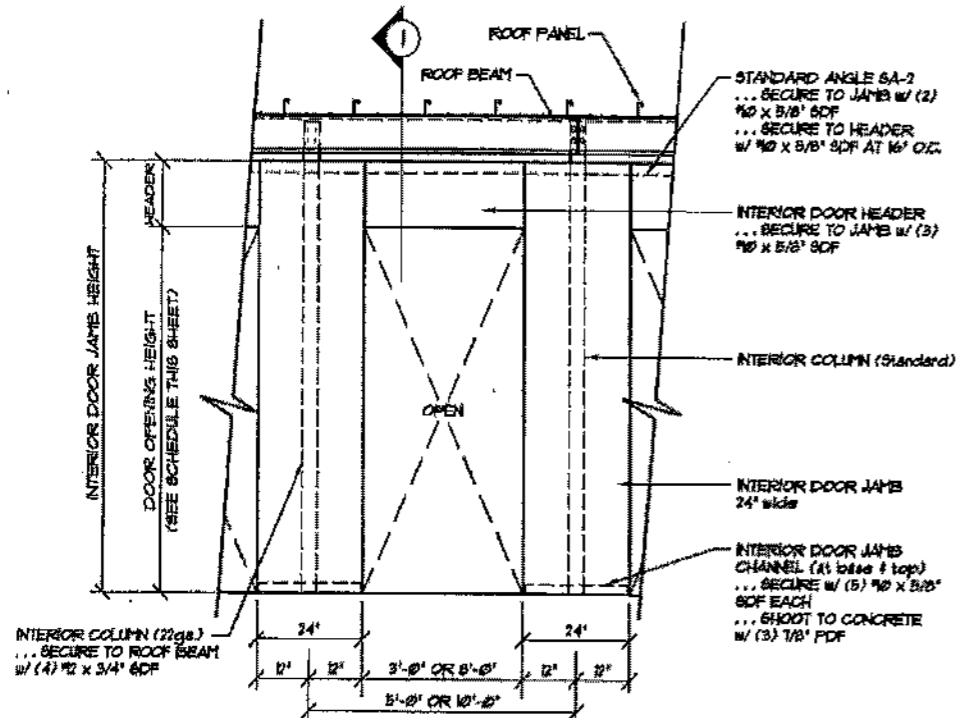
DETAIL FOR THE FIELD CUTTING AND COMPRESSION OF INTERIOR DOOR JAMBS
